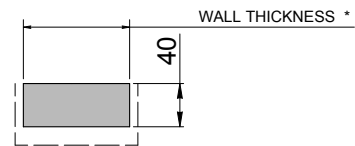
DETAILS FOR VERTICAL FRAME (STRAIGHT JAMB)
